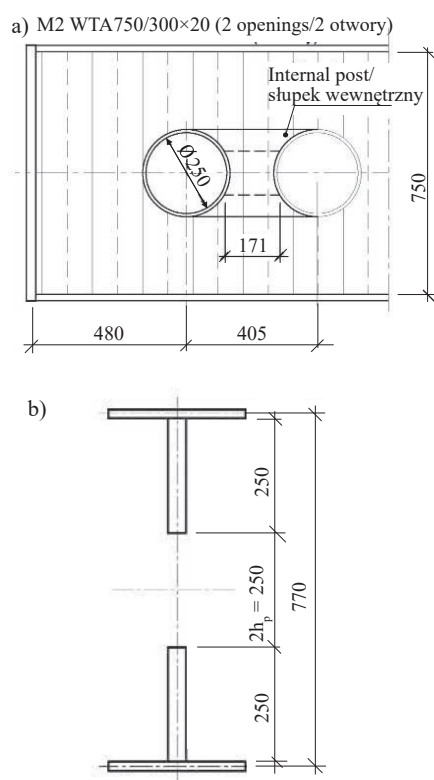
Girder with corrugated web with opening: a) internal post between openings in girder M2; b) vertical section
